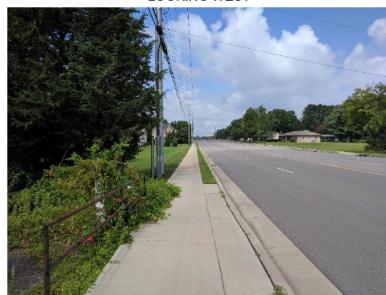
VETERANS PARKWAY CONNECTION LOOKING WEST
